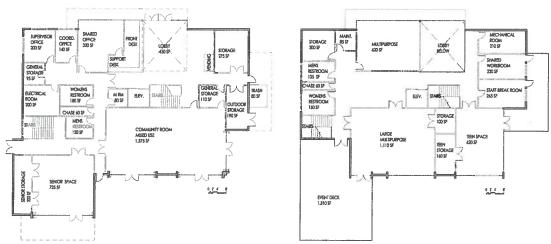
Phase 1 - Community Center Floor Plan- First and Second Floors
